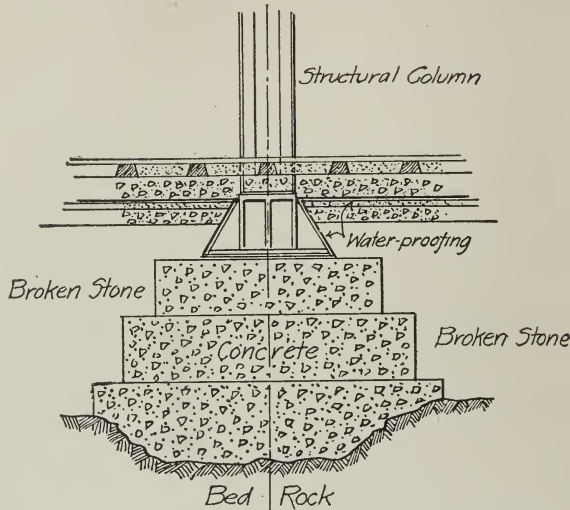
Filled-in Rock Fissure, New York Times Building.
